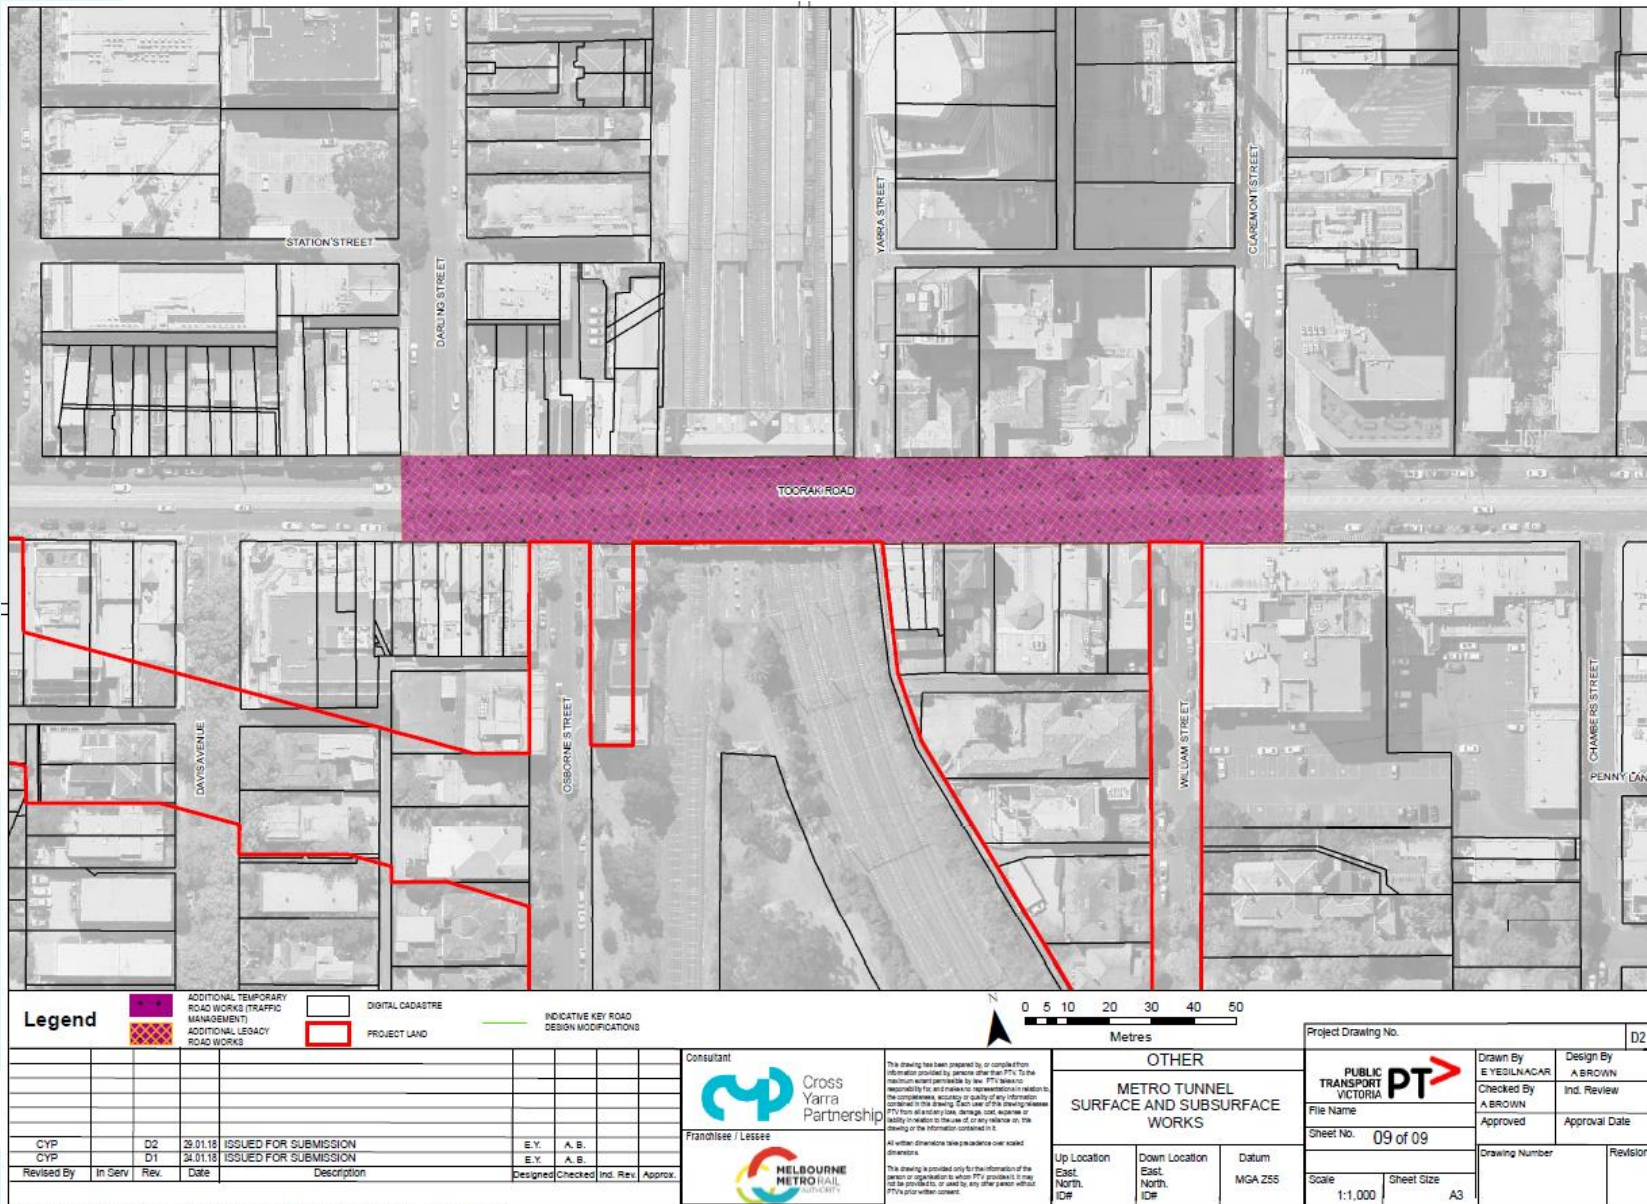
TOORAK ROAD ADDITIONAL ROAD SURFACE WORKS
